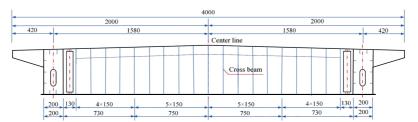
Cross-sectional view of composite stiffening beam (unit: cm)
